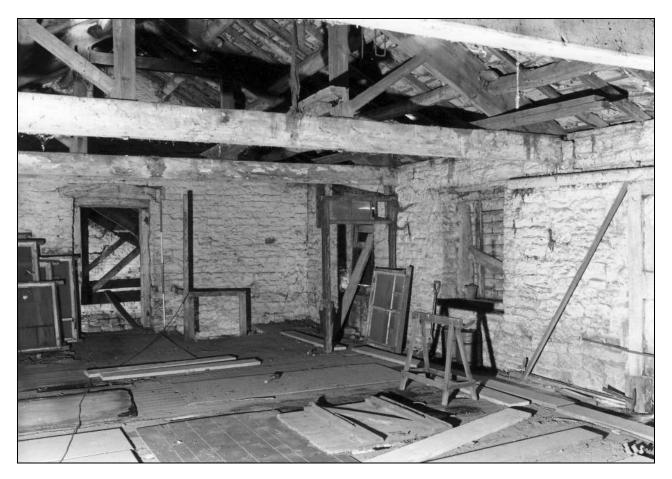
Building 1a: first floor, from the north-east (film 4, frame 12)
